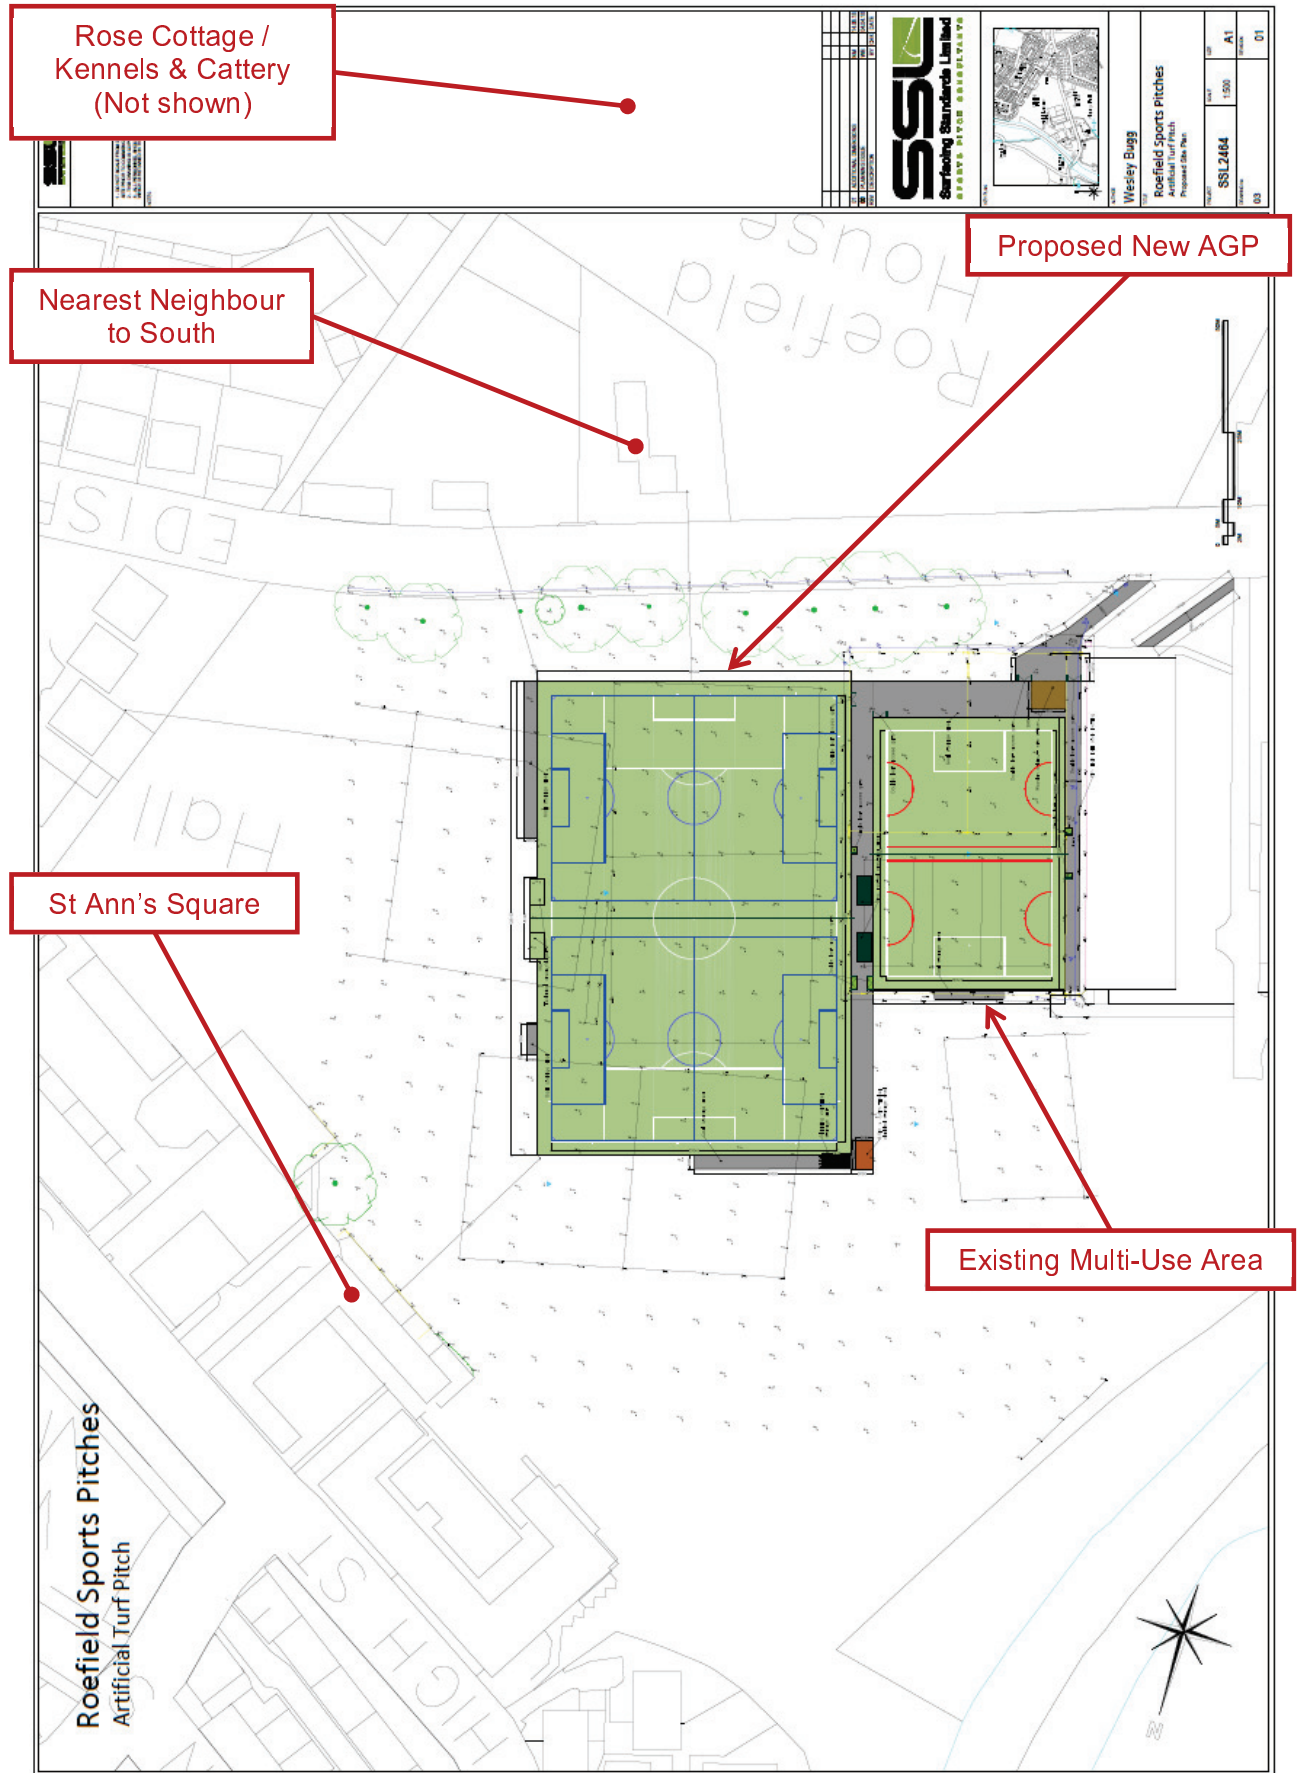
PROPOSED SITE PLAN (NOT TO SCALE)
